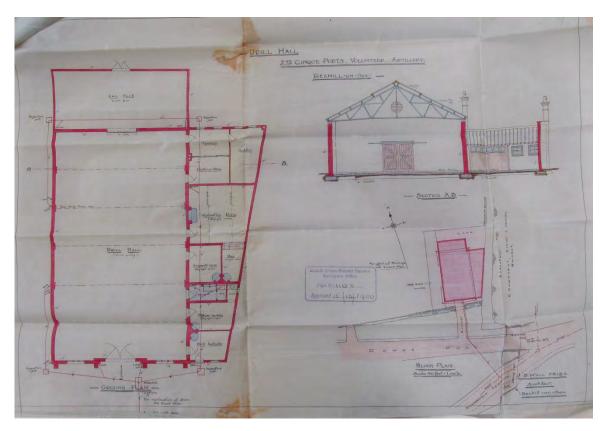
Plans of the 1901 Drill Hall. Copyright the East Sussex Record Office
